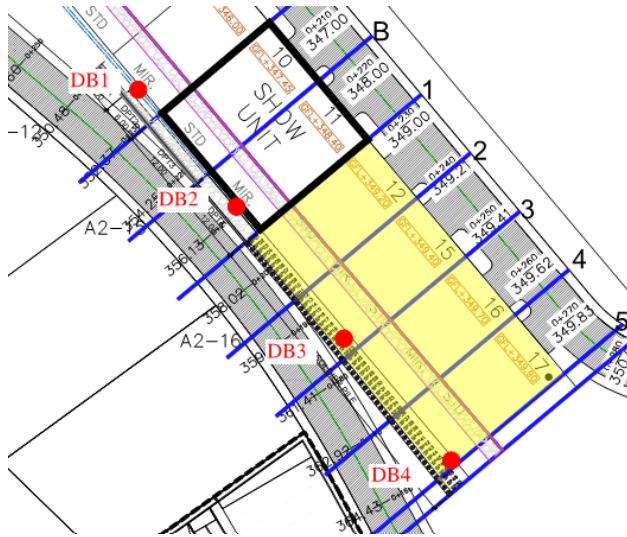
Plan view of the excavated site and soil investigation locations (area highlighted yellow is the excavated area)
